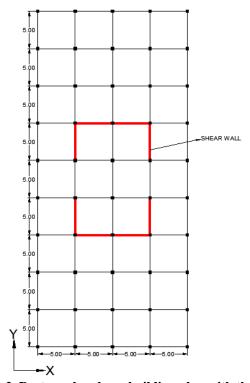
Rectangular shape building plan with their optimum location of shear wall
